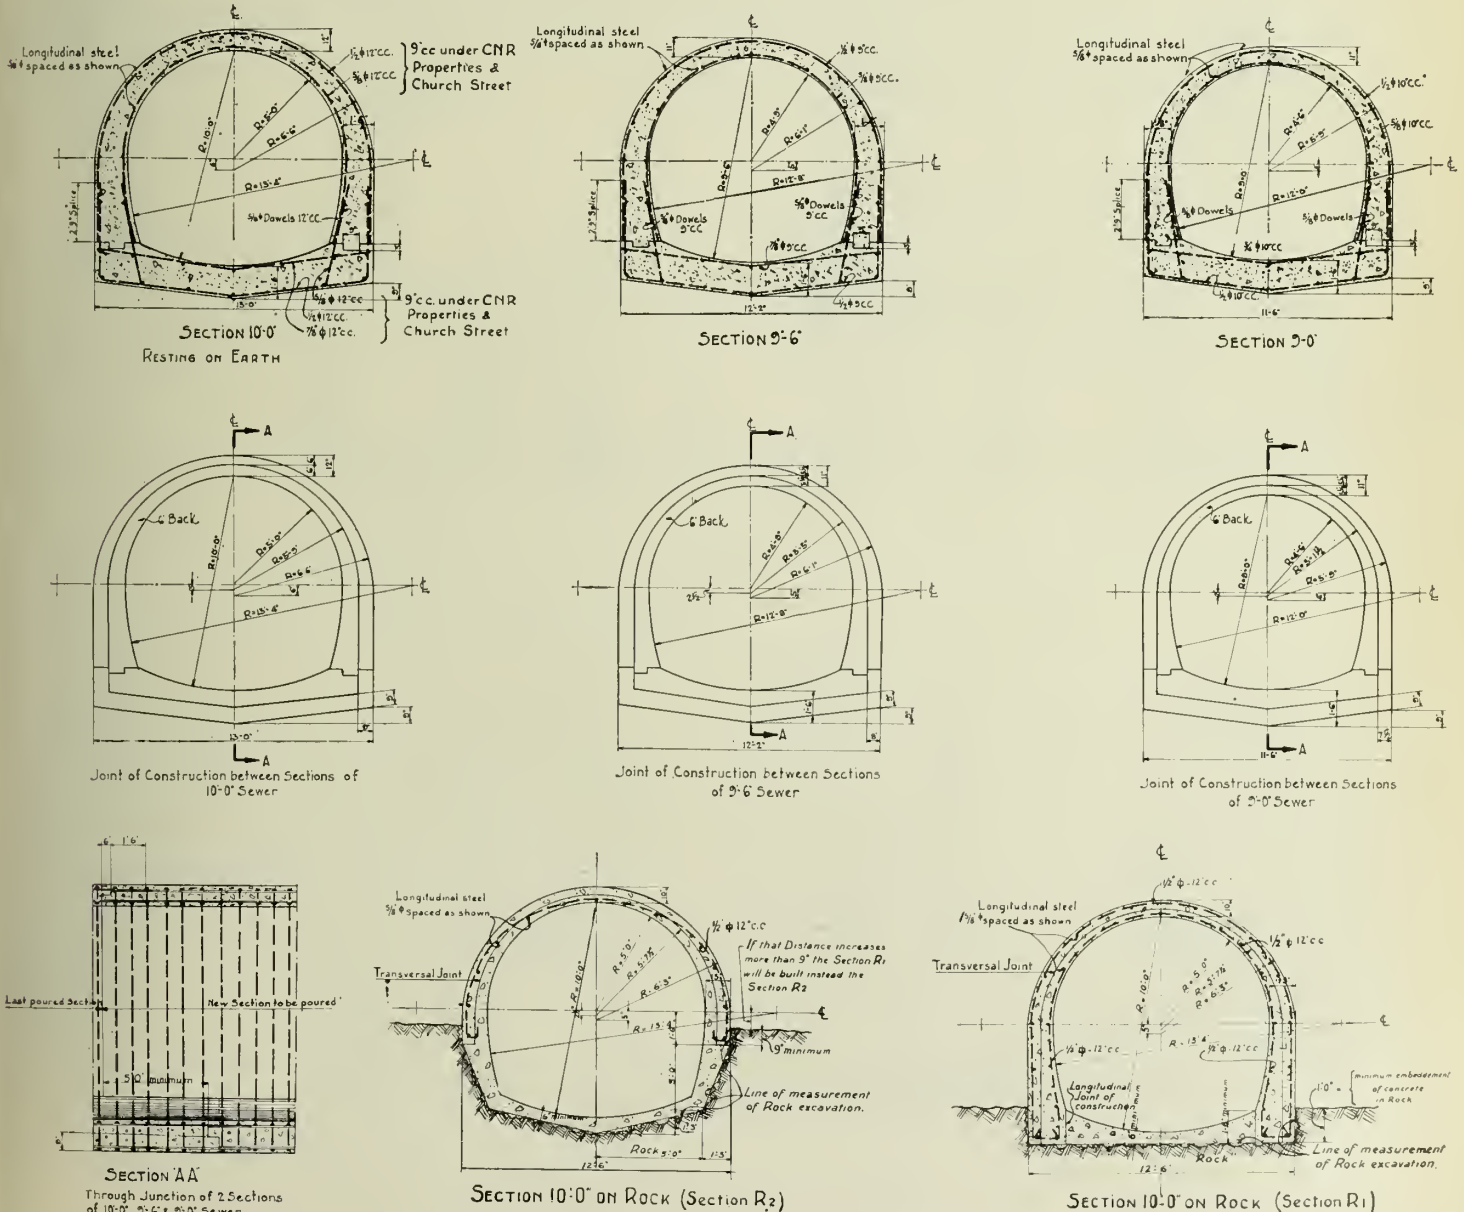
Typical Cross-sections for 10' 0", 9' 6" and 9' 0" Sewers.
